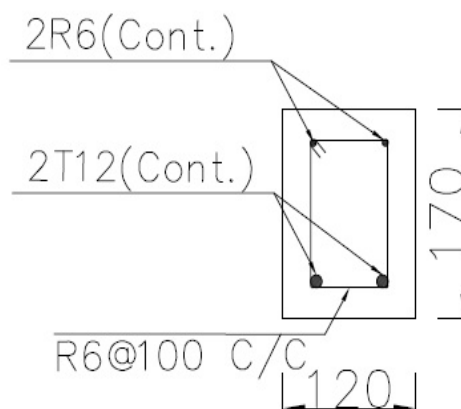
Cross Section of the RC and the SFARC Beams (dimensions in mm)
